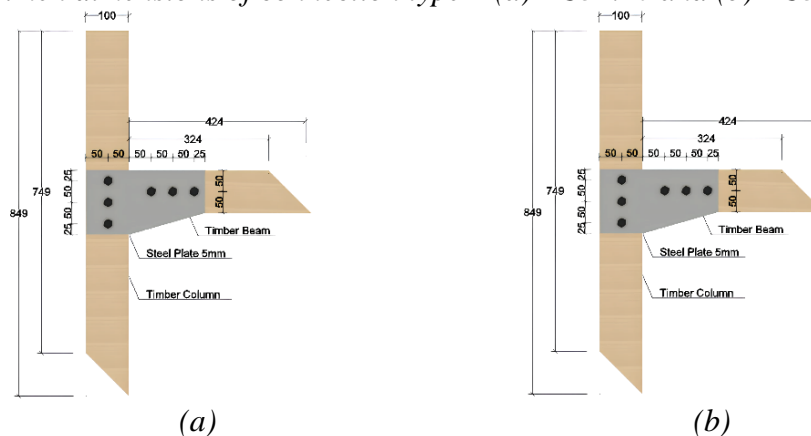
Specimen dimensions of connection type 2 (a) BC33.10 and (b) BC33.12.
